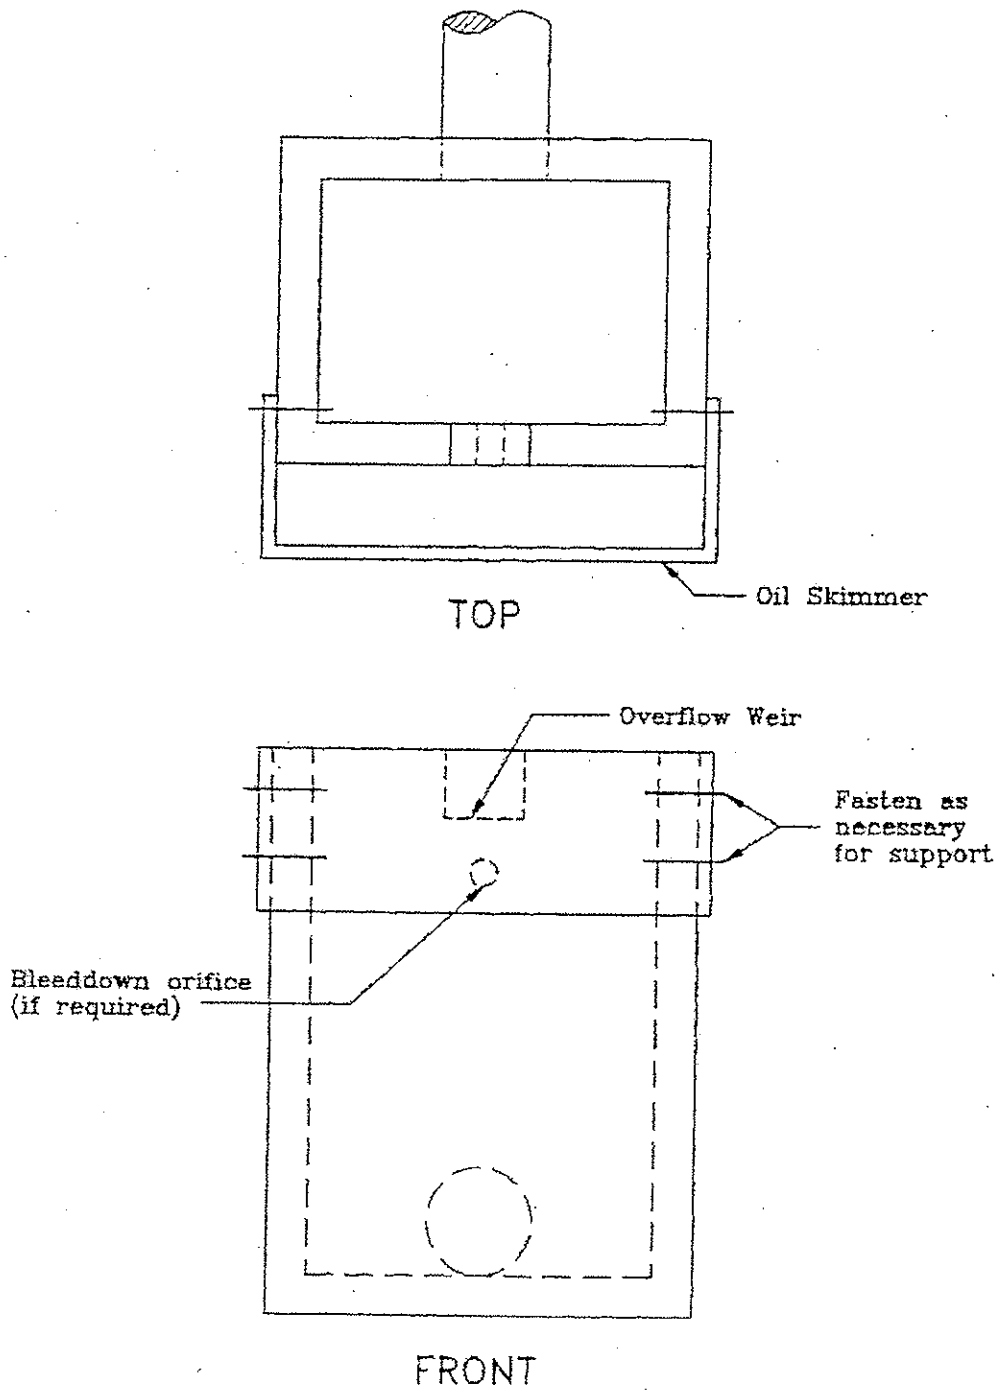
Oil skimmer detail for a typical outfall structure (N.T.S.)
